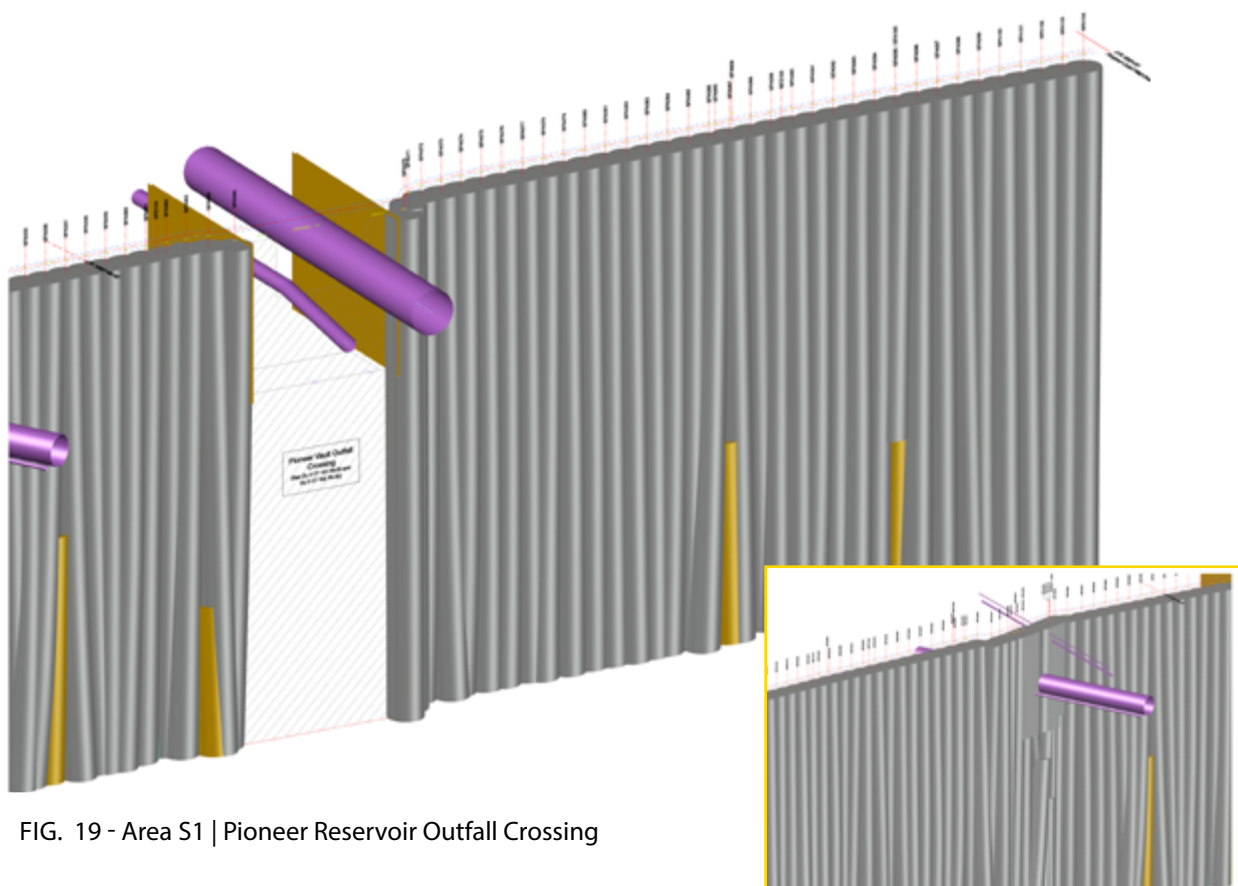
Area S1 | Pioneer Reservoir Outfall Crossing
